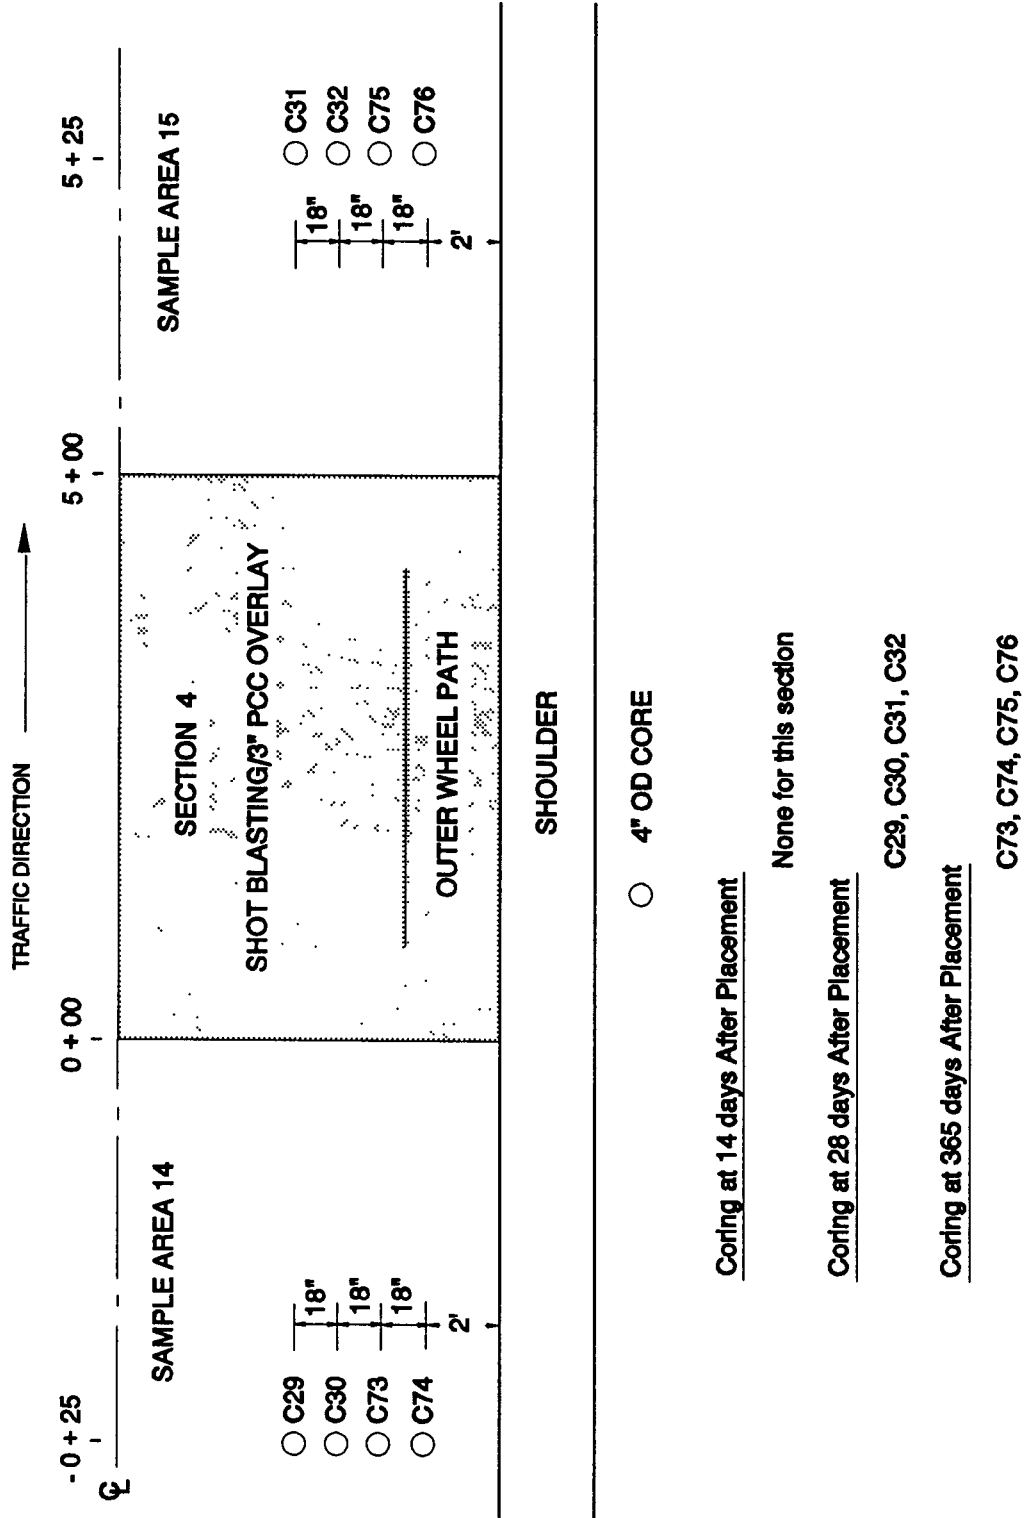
Example of "Post-Construction" Sampling Plan for Test Section 4
